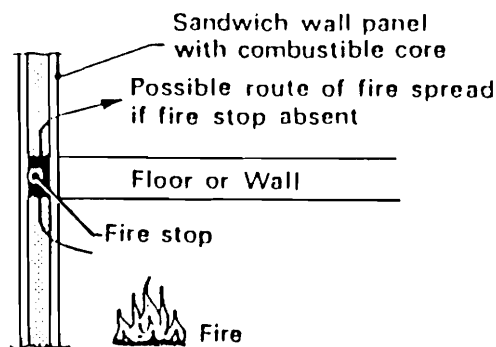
'Junctions between sandwich panels and fire separating walls or floors should always be fire-stopped....'
